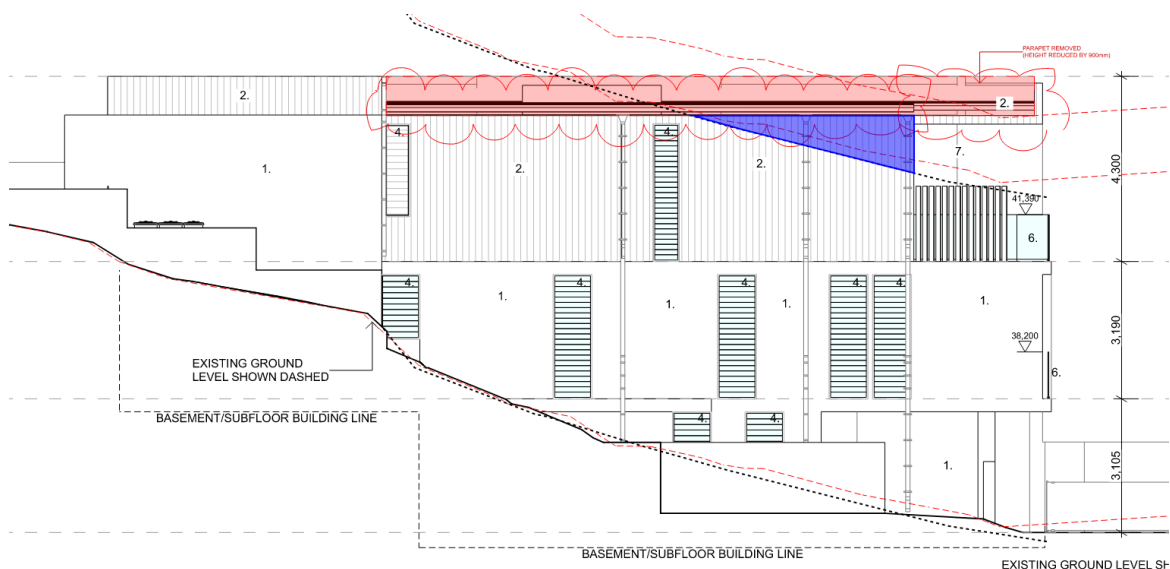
Extent of External Wall Height breach identified in blue – Southern Elevation
